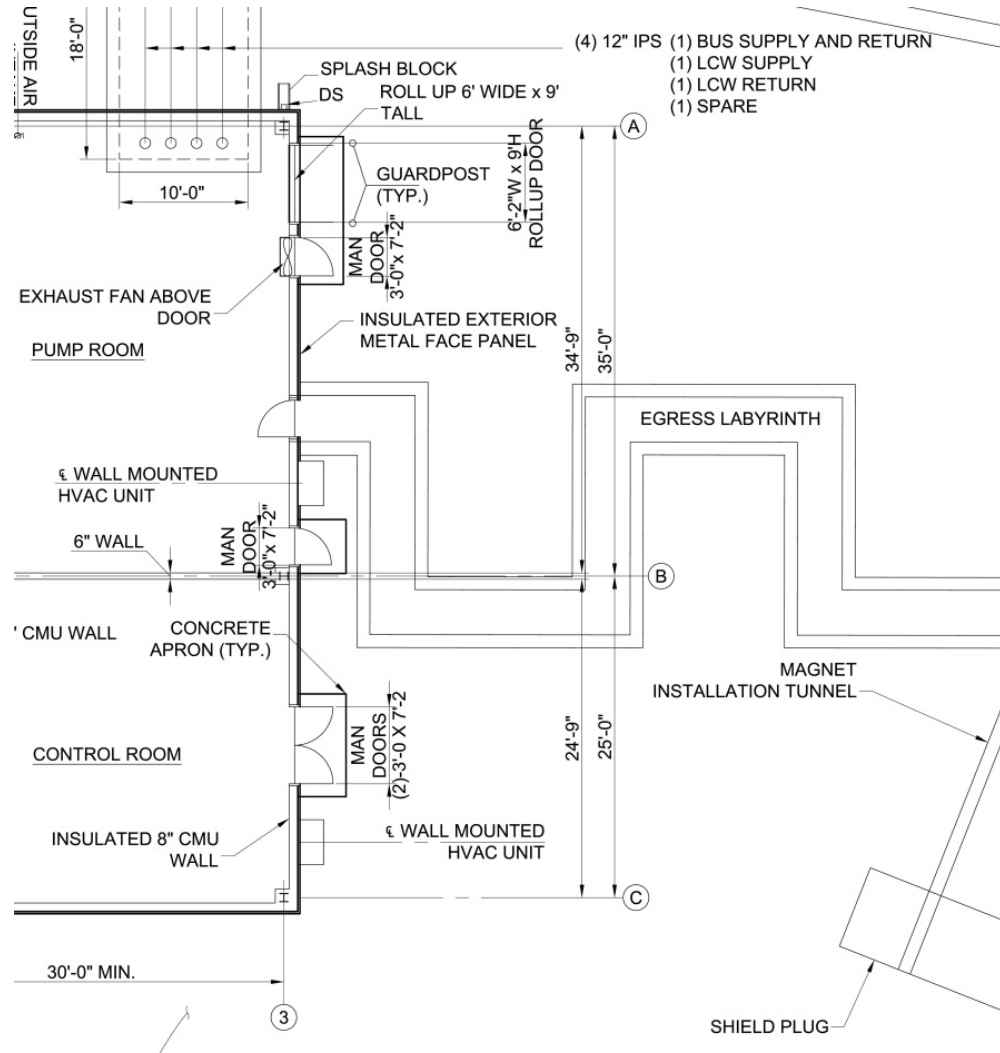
Primary Beam Service Building (LBNE 5) Egress Labyrinth.
